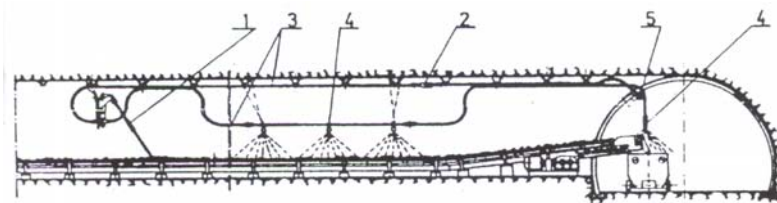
Automatic sprinklers „Rosa“ for wetting the reloading and conveyor belts (1-lever to open the flow of water, 2-filter, 3- inlet pipe, 4-spray nozzle, 5-valve)
